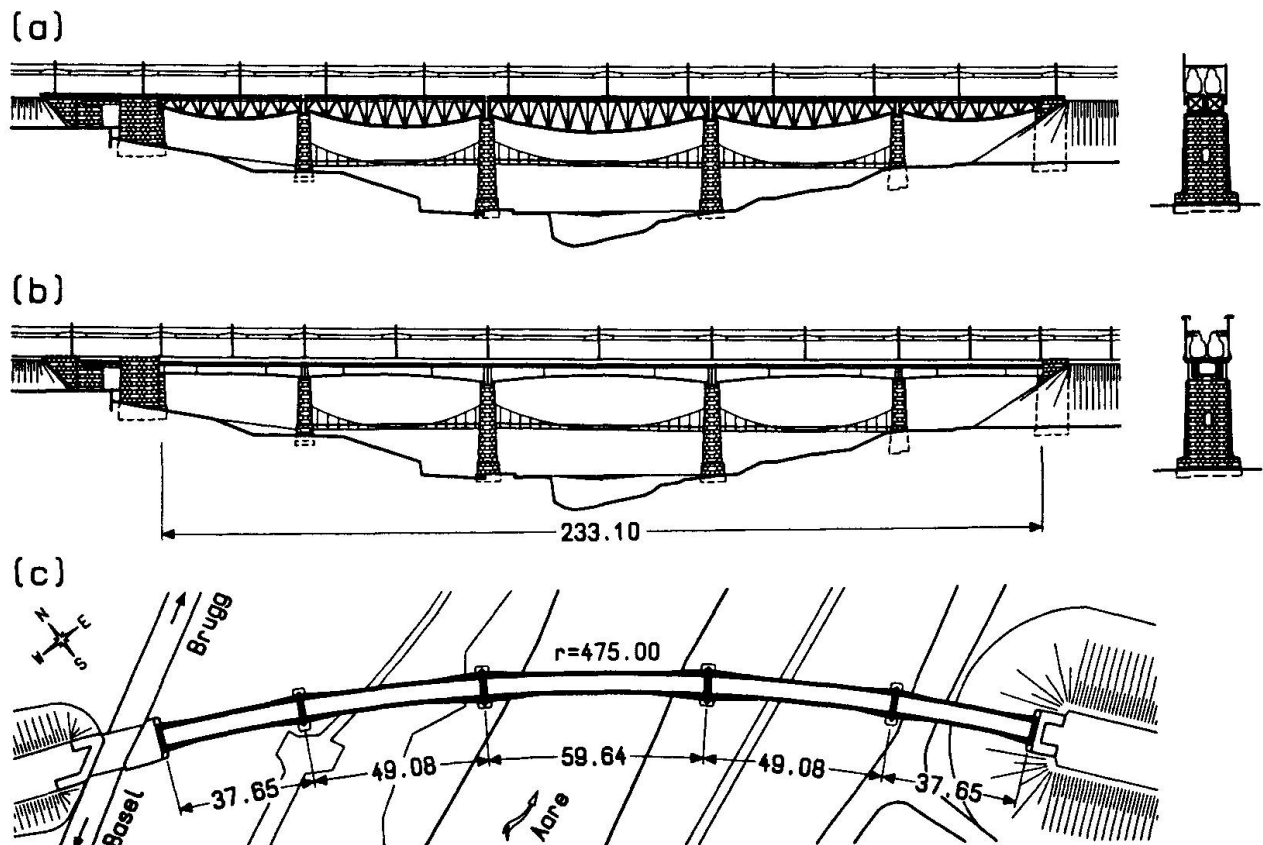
Overview: (a) Steel superstructure on natural stone masonry substructure; (b) New post-tensioned concrete box girder on strengthened substructure; (c) Plan view of new bridge. Note: Dimensions in metres.
